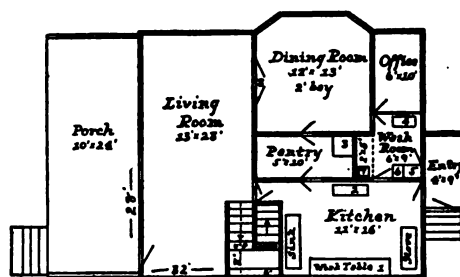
First-floor plan of a set awarded first prize in a practical farmhouse contest conducted by the Iowa Agricultural College. 1. Built-in table cupboards and bins below; 2. wheel table; 3. iceless refrigerator; 4. wash basin; 5. chimney; 6. clothes chute, second floor to cellar; 7. toilet, screened. For second floor and cellar plans see figs. 481 and 482.
